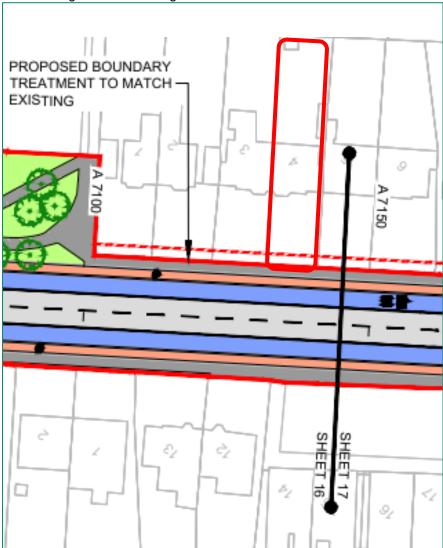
Proposed new Layout at 4 Maypark, Malahide Road
